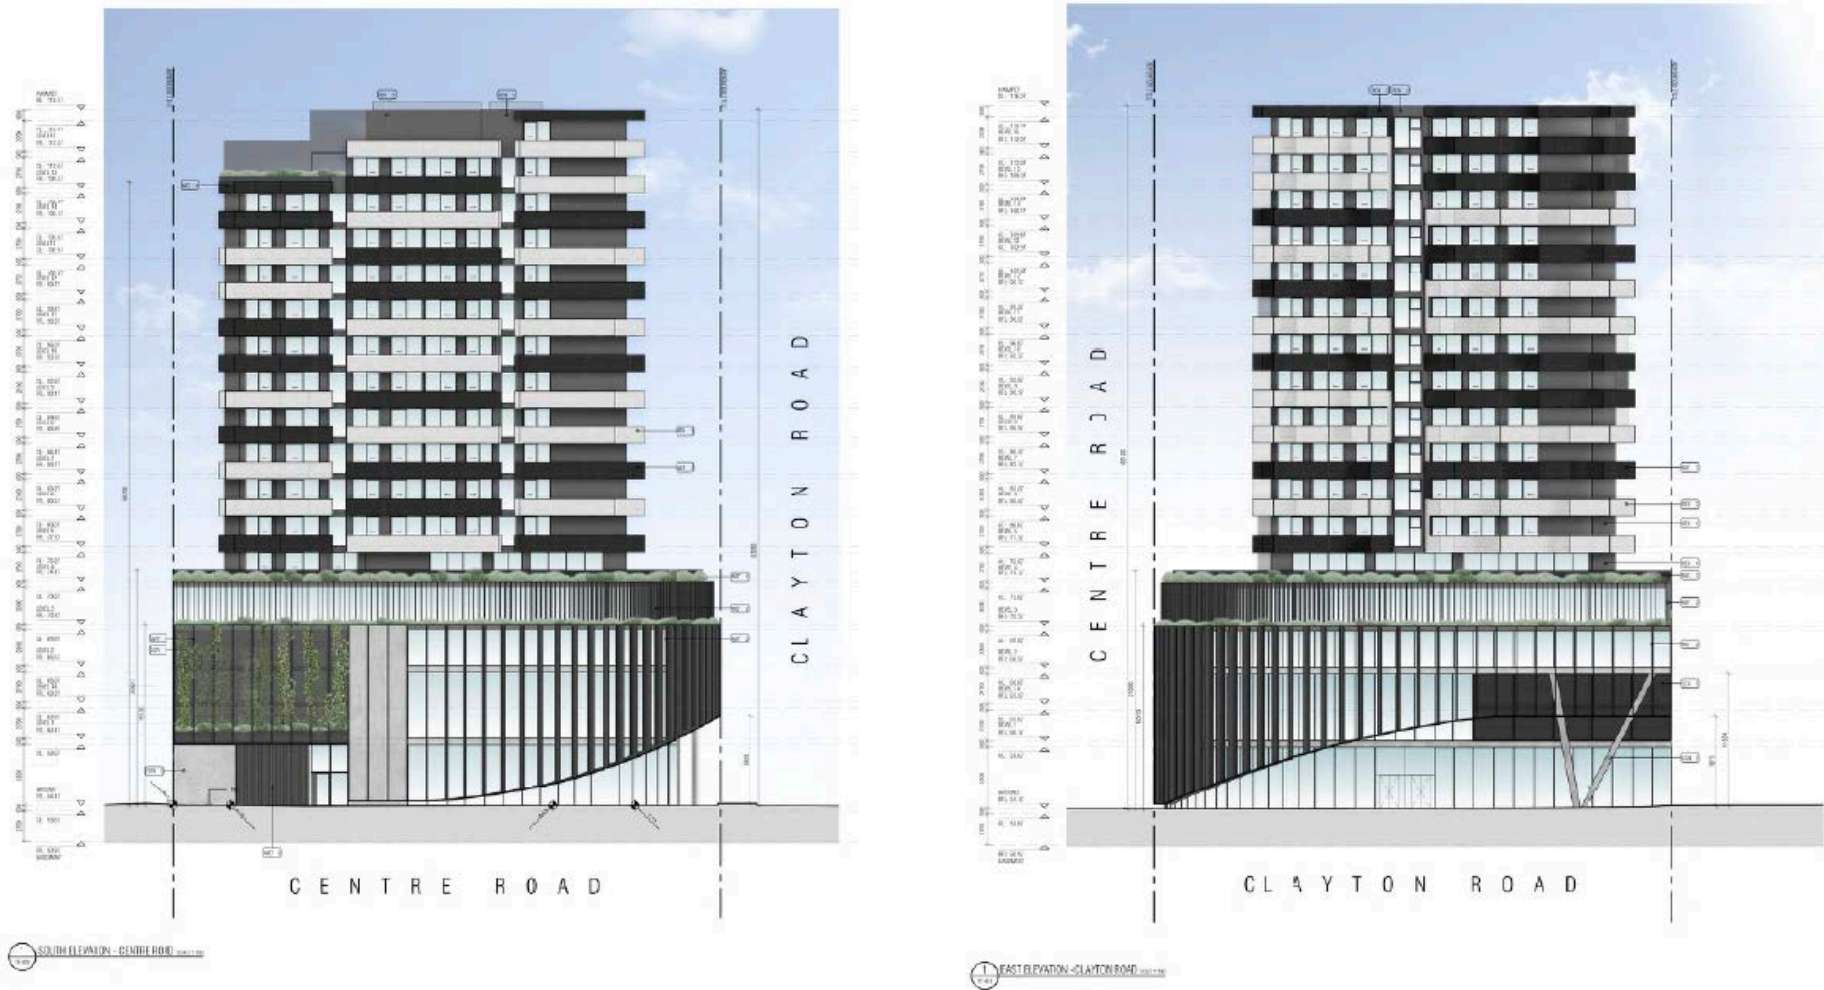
Elevations South (Centre Road) and East (Clayton Road), prepared by Ewart Leaf
